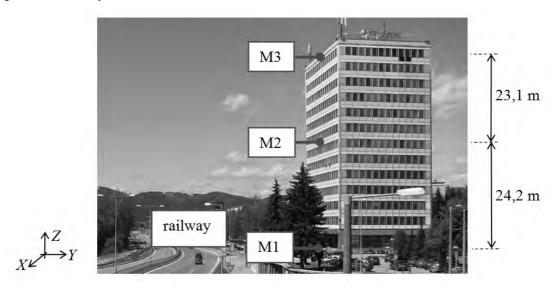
Situation of reinforced concrete building and railway line, Distribution of measuring points: M1 – basement; M2 – 7. floor; M3 – roof
